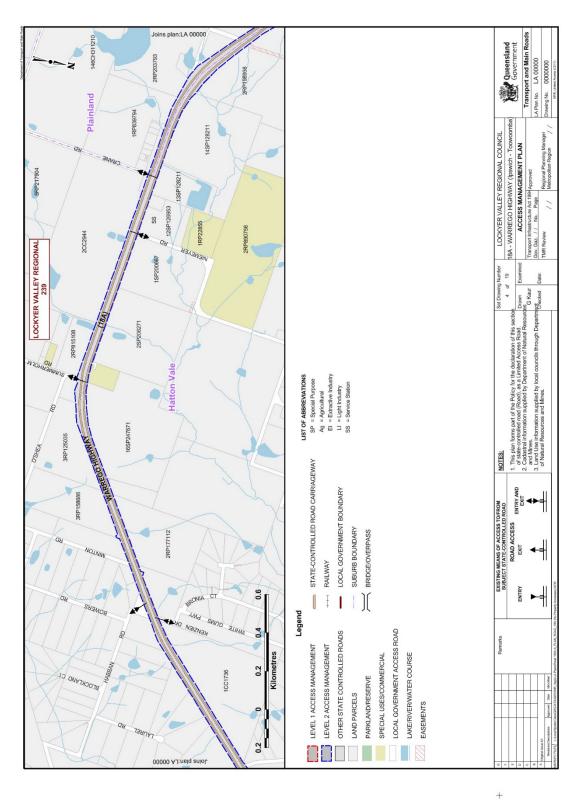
(b) - Limited access plan – Showing property access – Urban example
